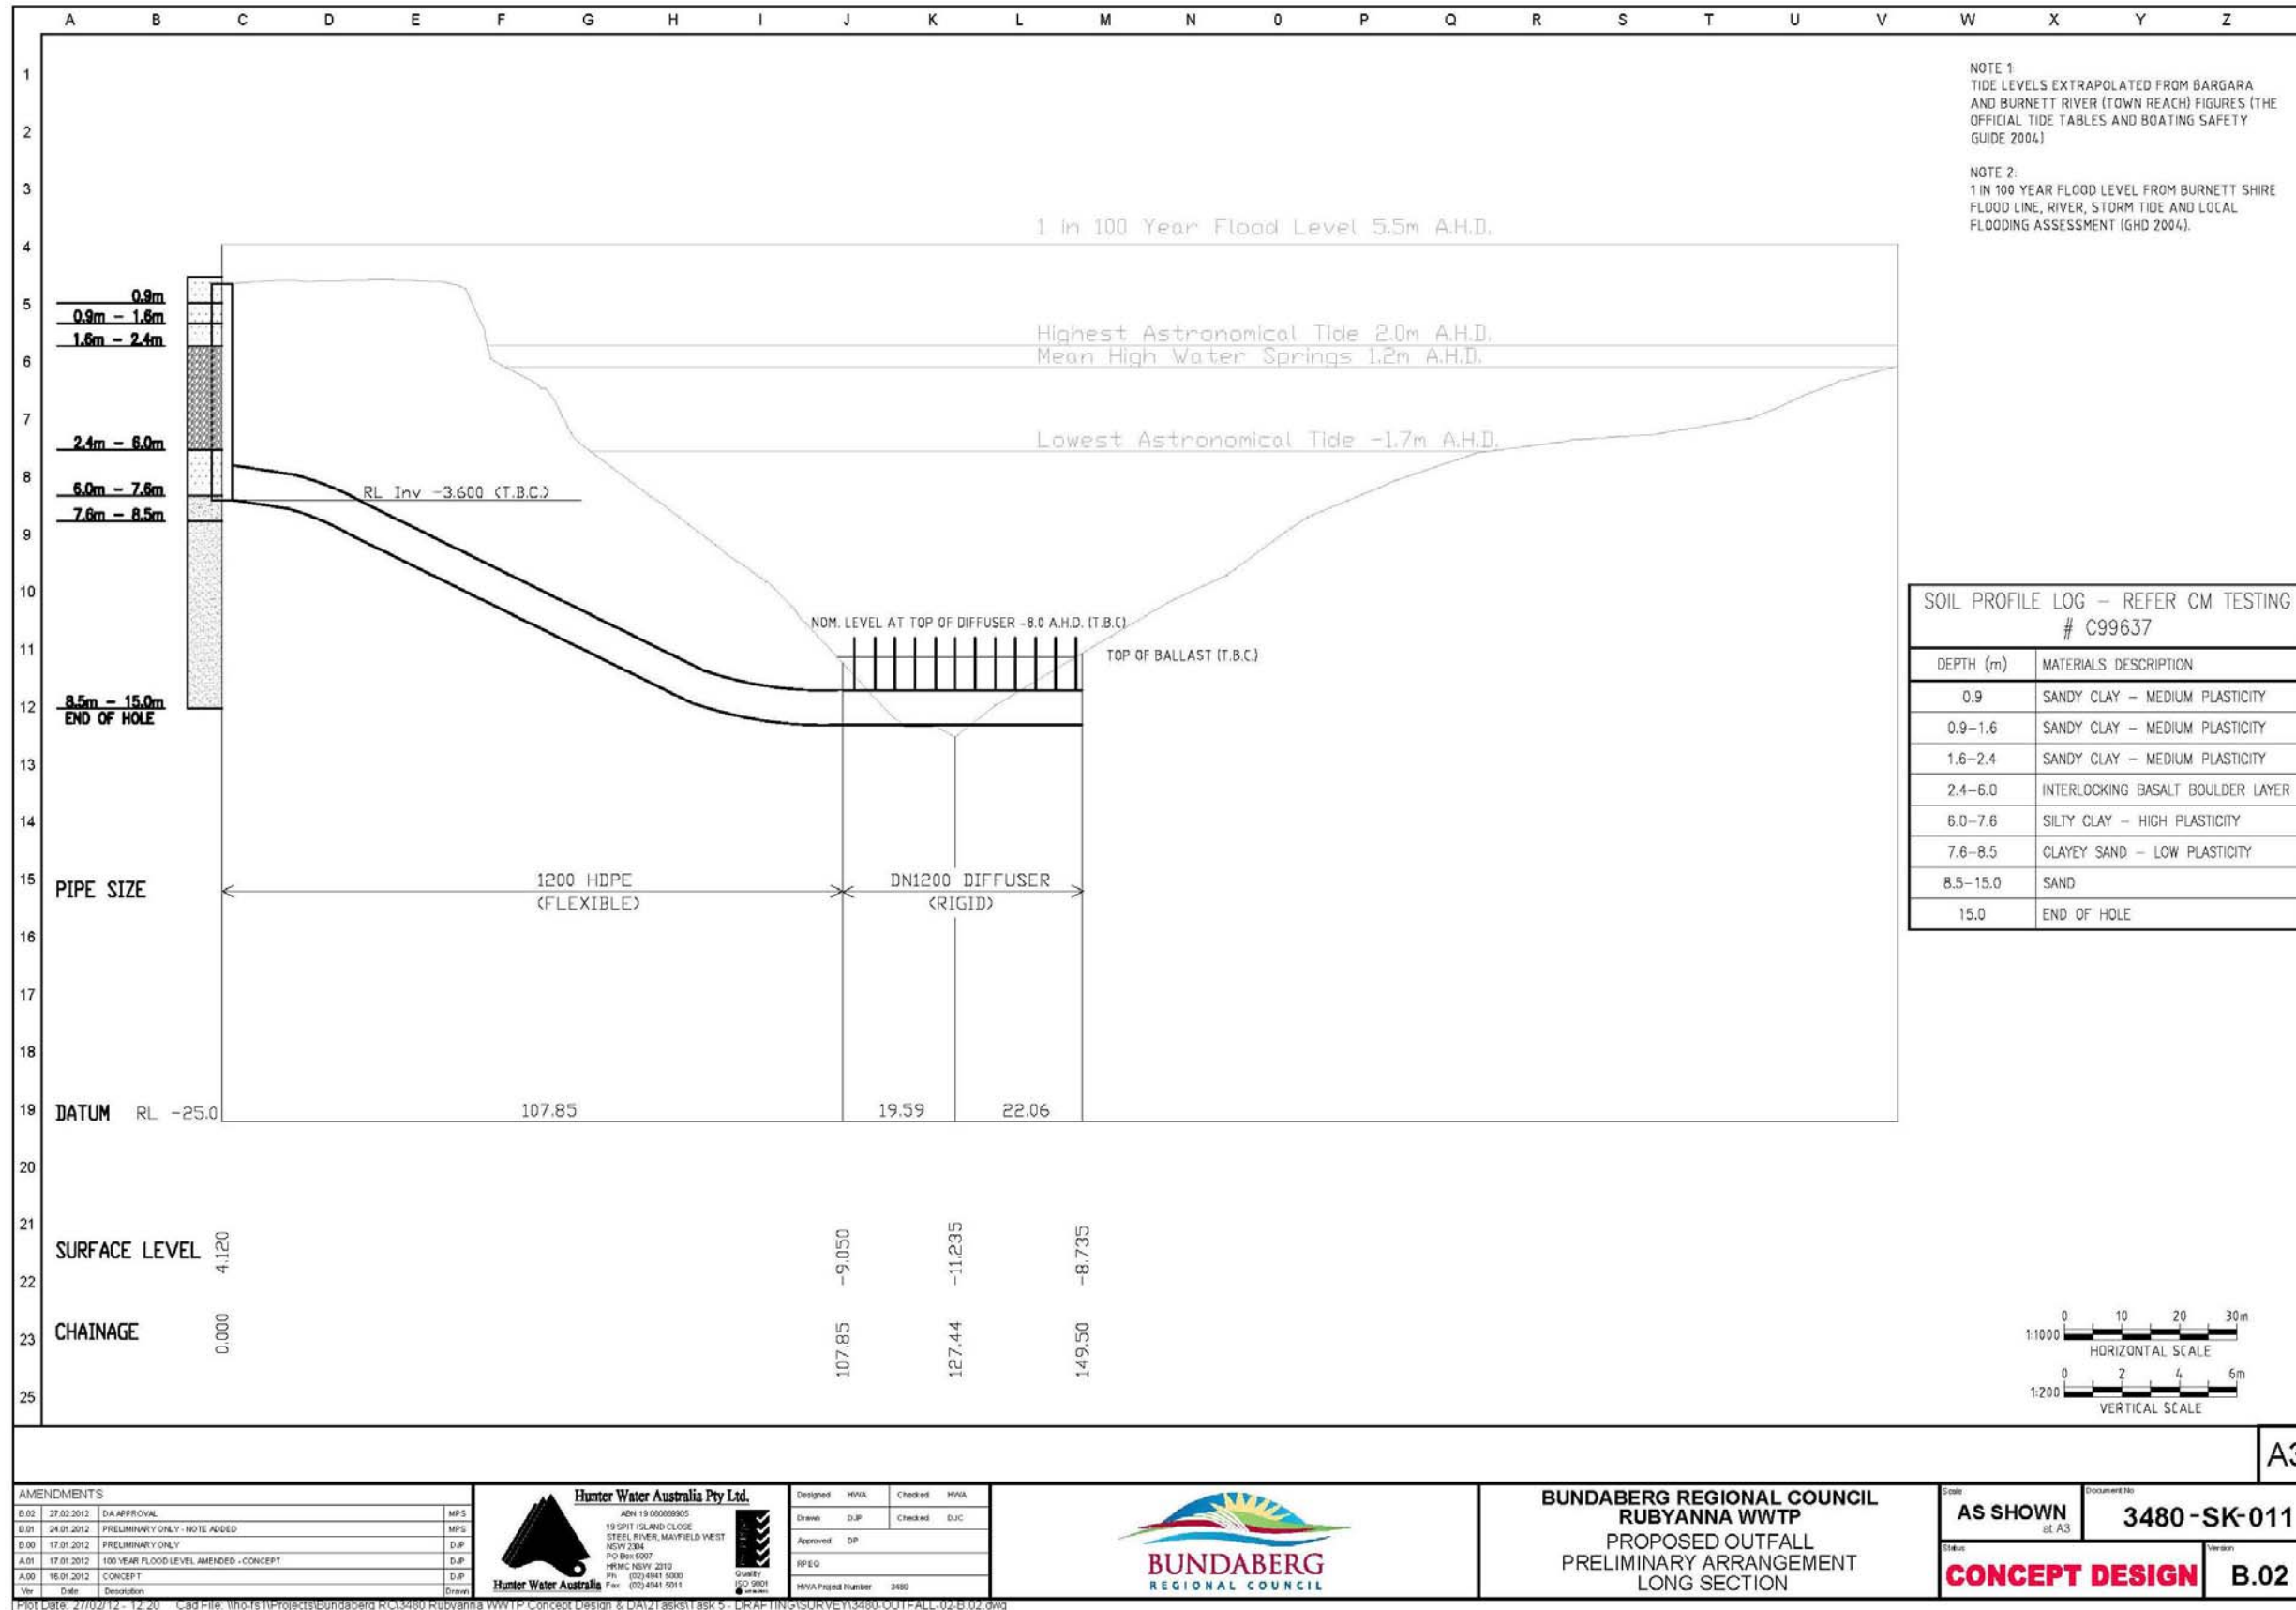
Cross Section of the River Channel at the proposed Outfall Location and Sketch of the Concept Diffuser Design [Ref: HWA, 2011]
